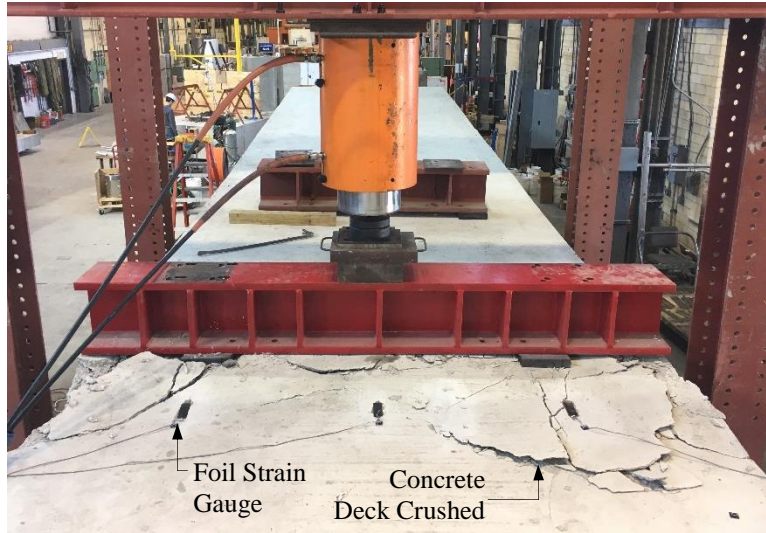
Concrete Deck Crushed at Loading Point – Tub #3
